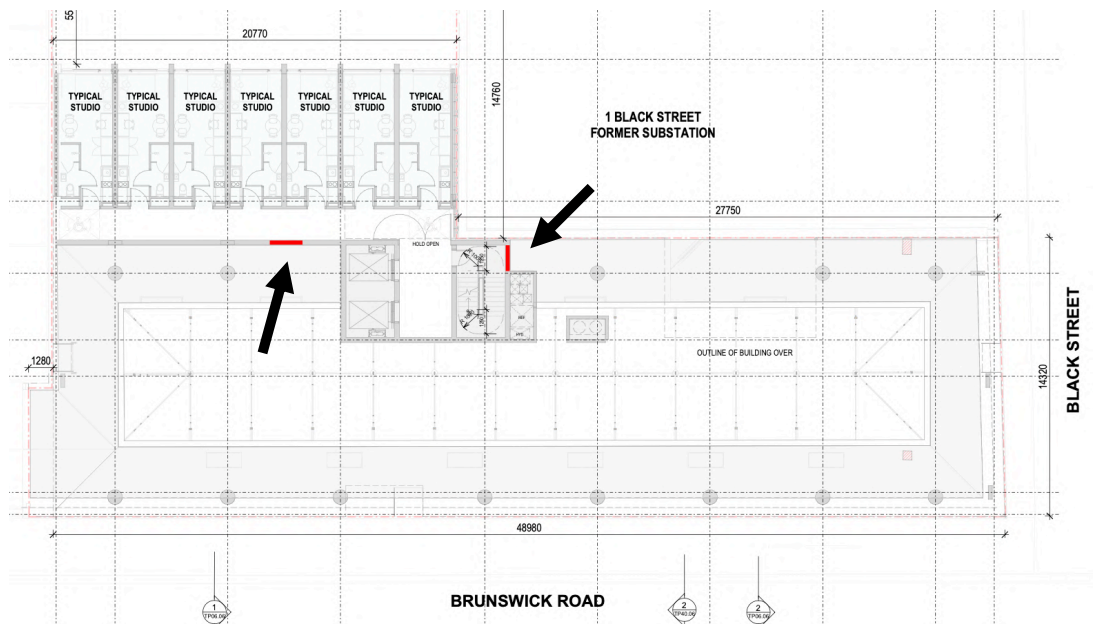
Drawing extract showing the proposed location of access points to the void of the retained roof (marked with black arrows).
